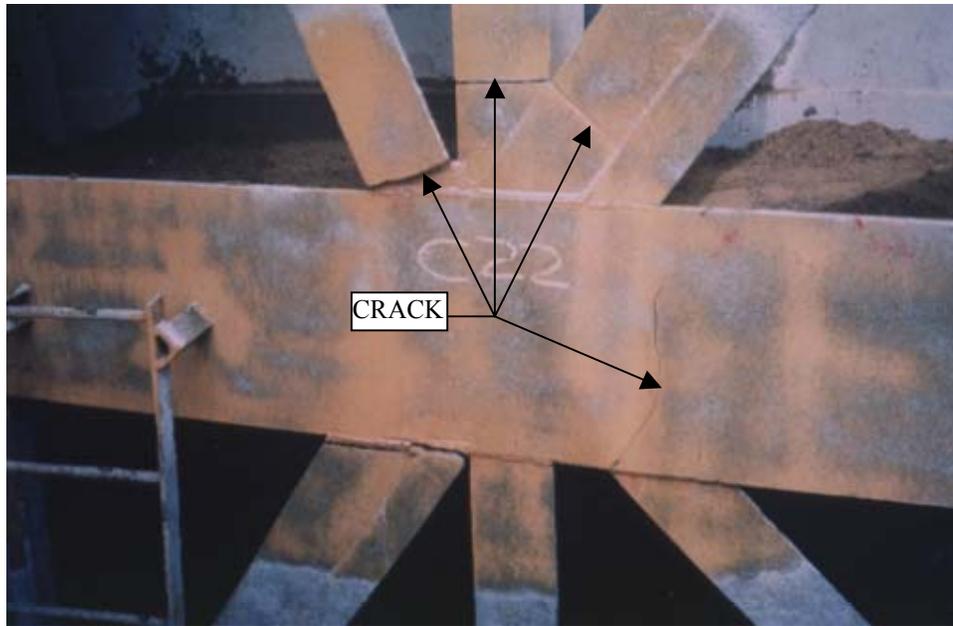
Cracked girder, diaphragm, and bracing in a lift gate
